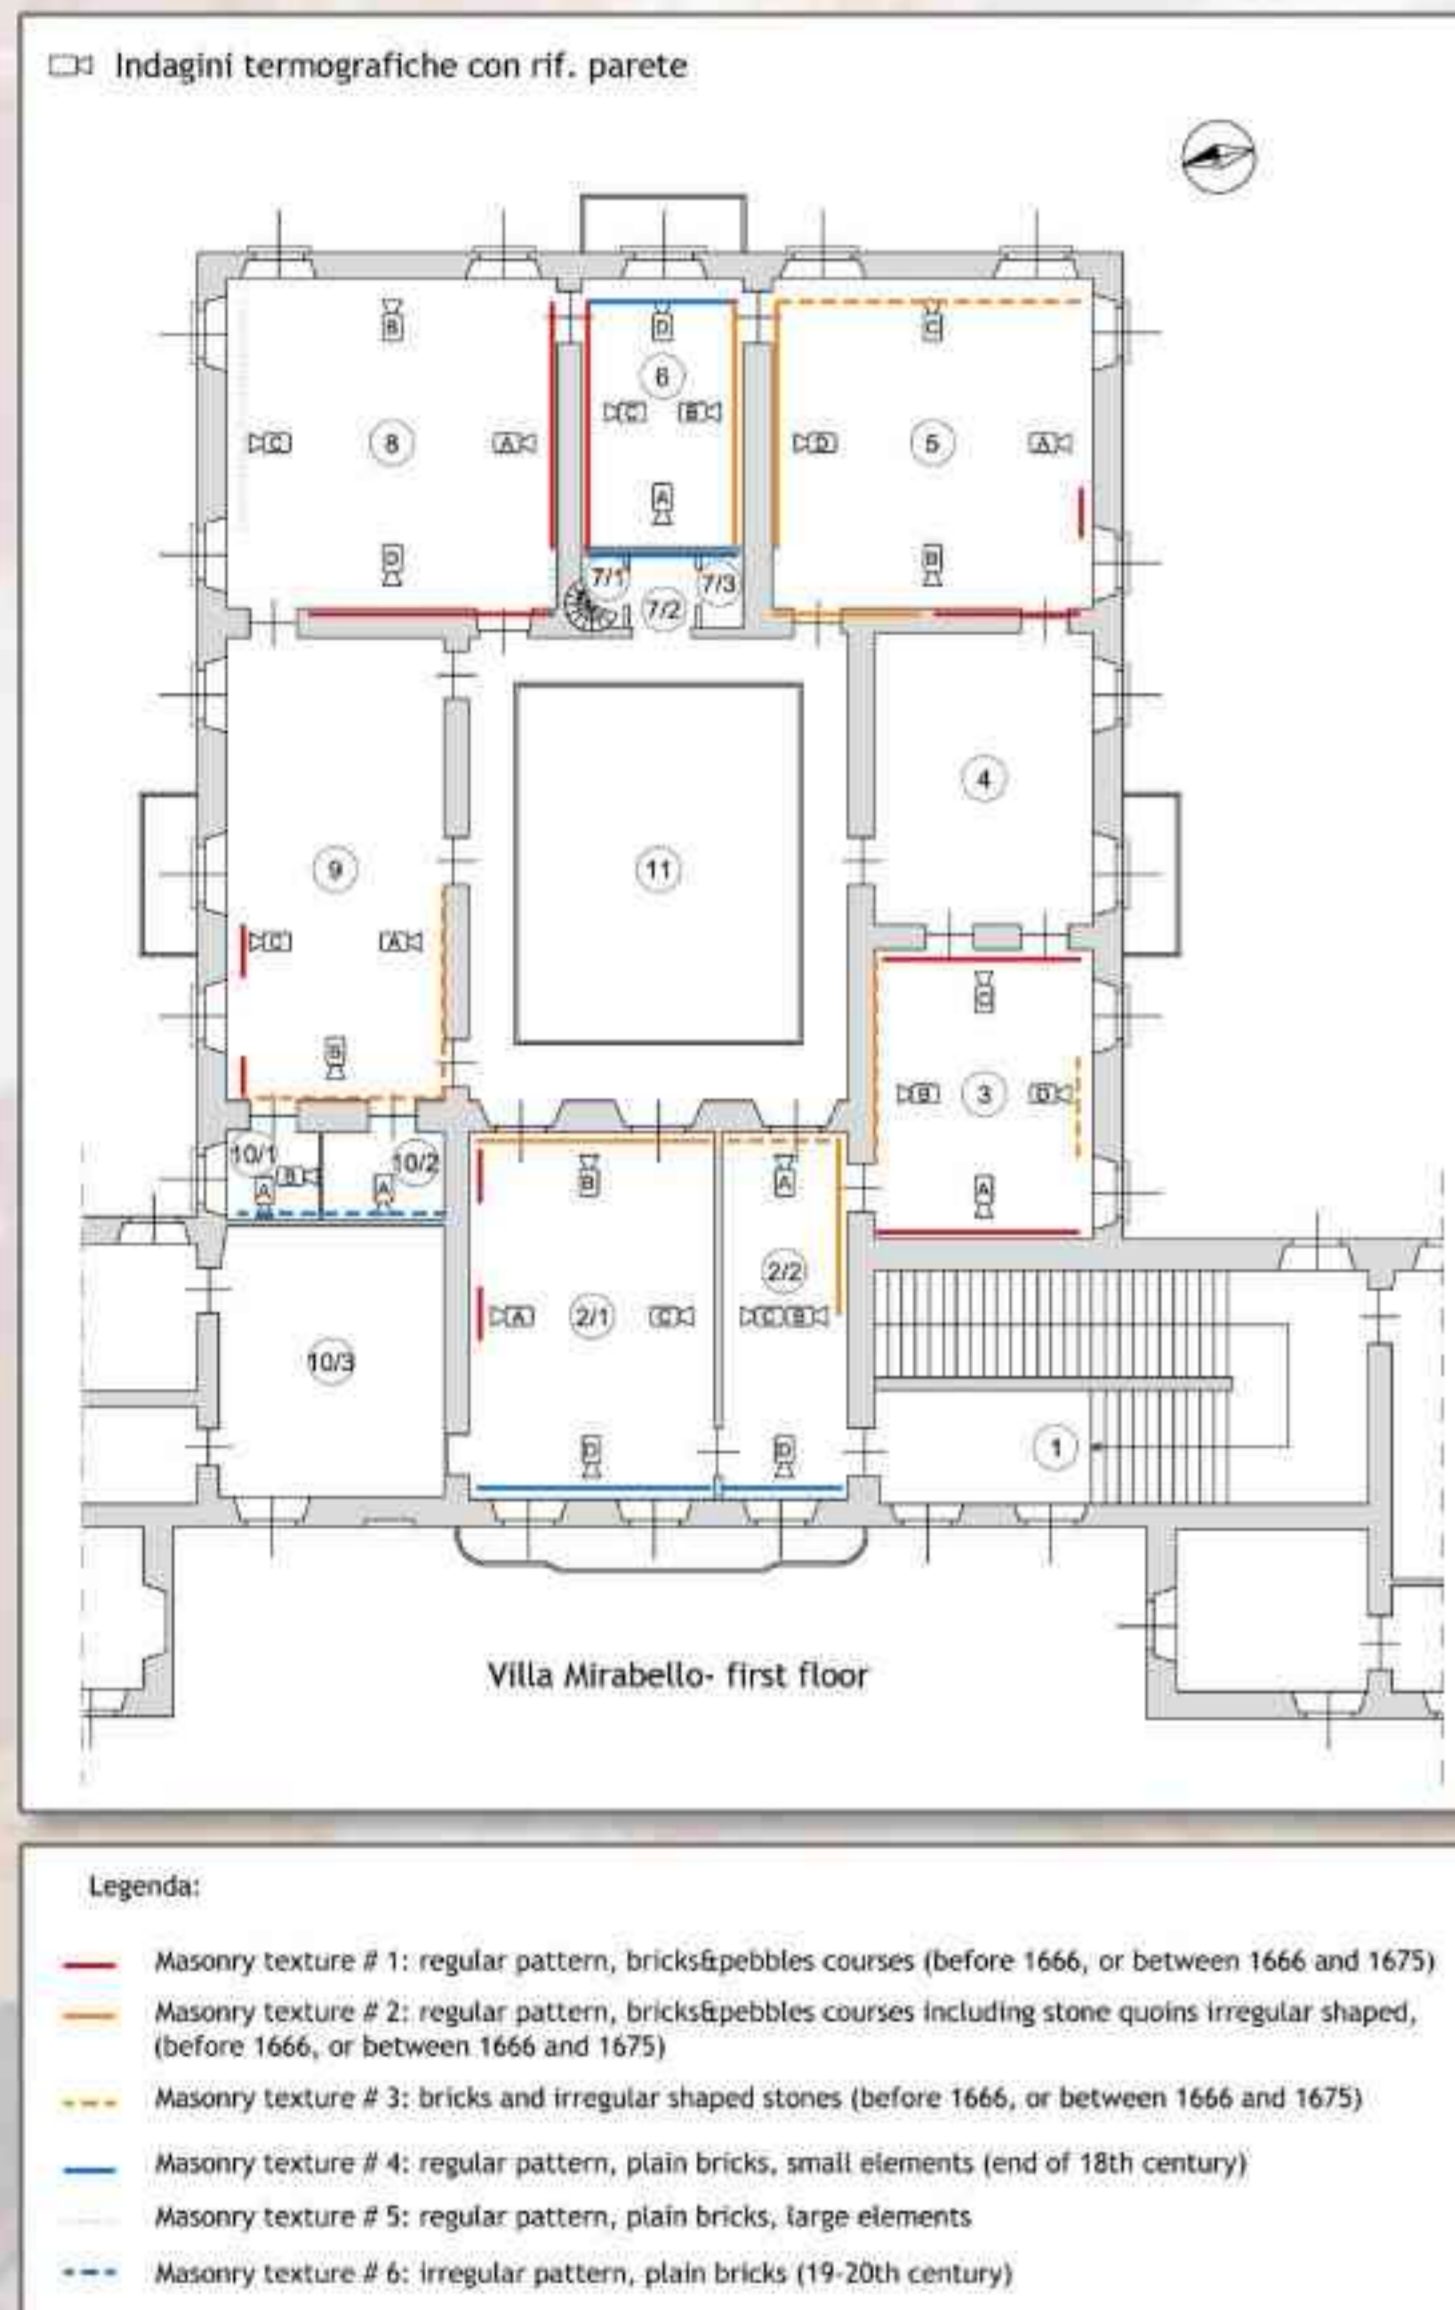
, plant of first floor showing results of integration between historic research and IRT
